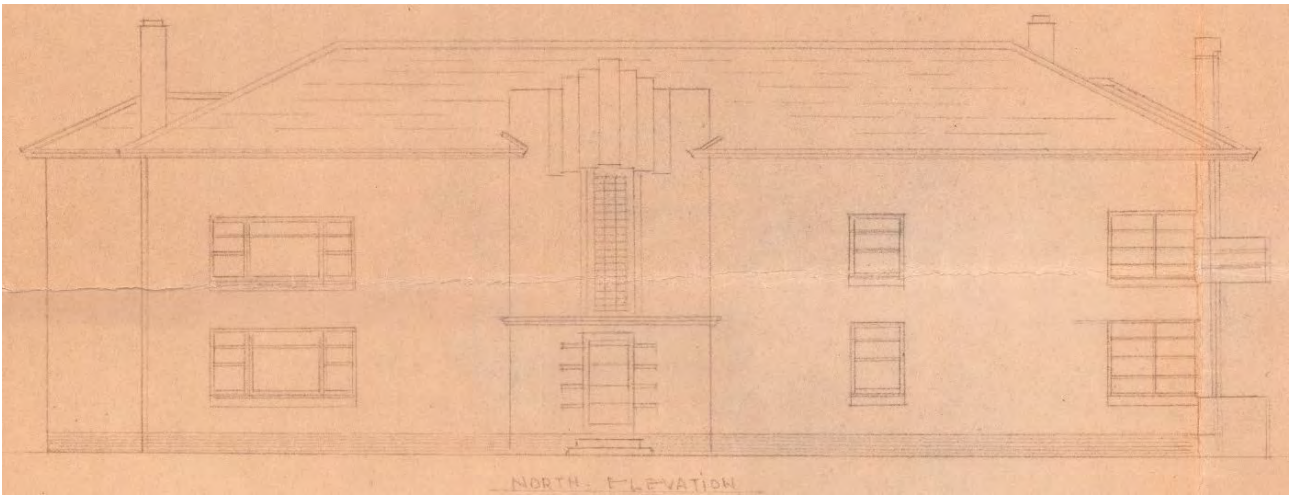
Original drawing, north side elevation of 58A Westbury Street. (Source: Council building file)
